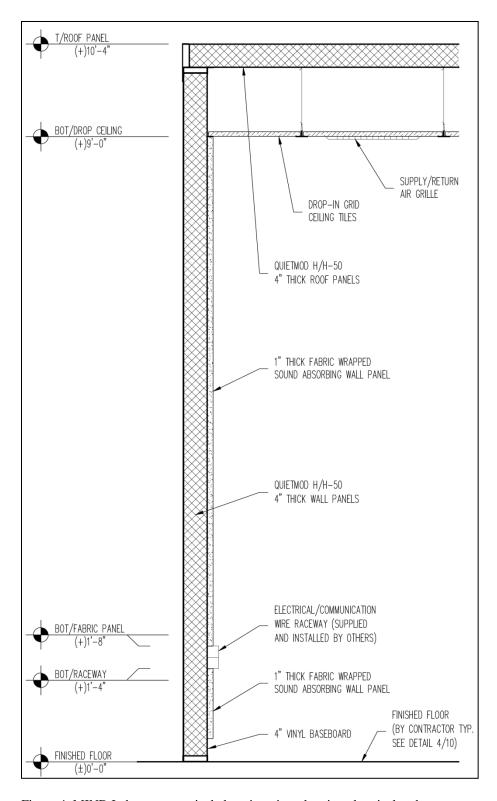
MIND Laboratory: typical elevation view showing electrical and communications raceway, sound-absorbing wall panels, suspended ceiling, and roof. (Adapted from Noise Barriers, LLC, 2011.)
